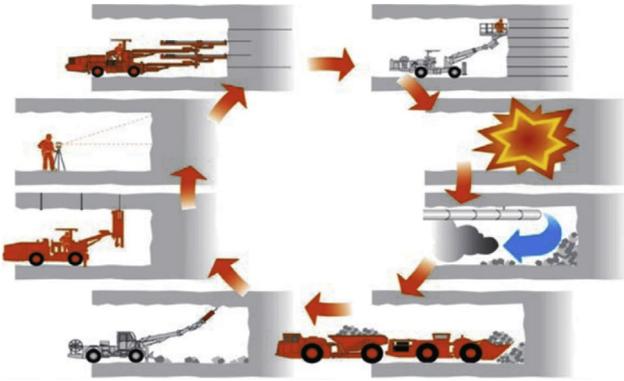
D&B method cycle: drilling → charging → blasting → ventilation → loading → scaling → reinforcements → measuring (Image: Sandvik Mining and Construction Finland).
